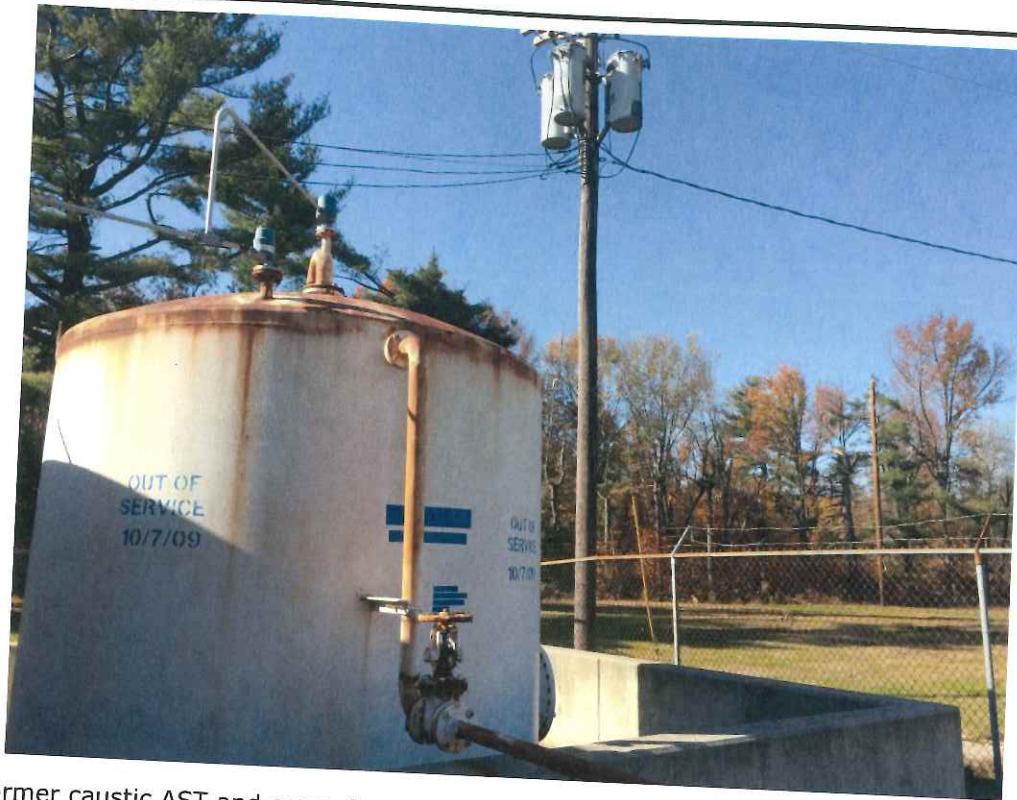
Former caustic AST and concrete containment adjacent to treatment building. Three pole-mounted transformers in background.
